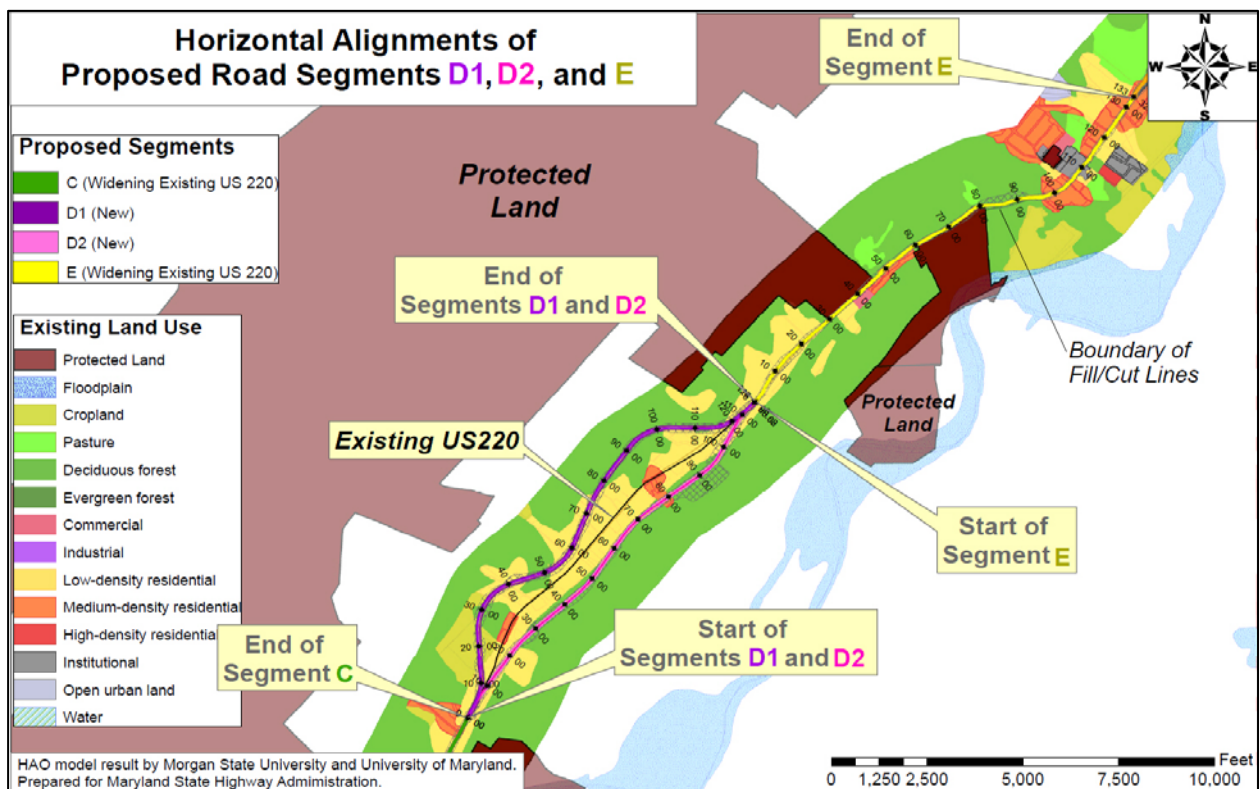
Horizontal Alignments of Preferred Road Segments D1, D2, and E.
